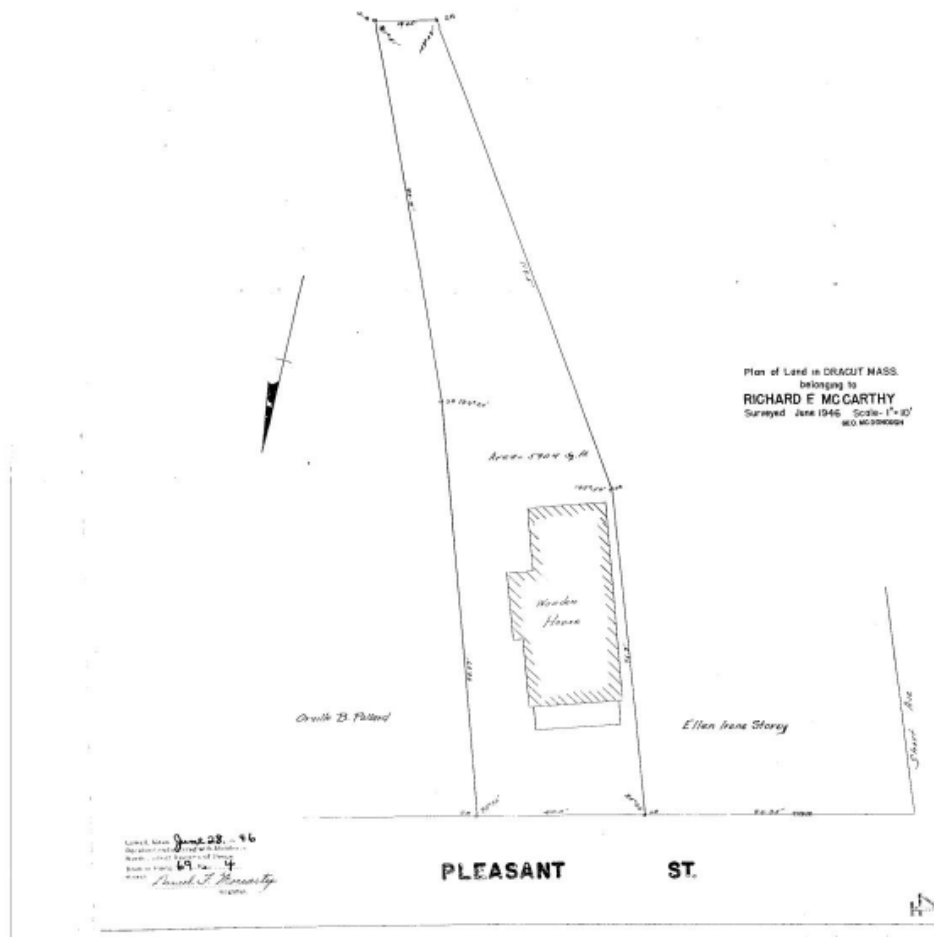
167 Pleasant Street 1946 (MCRD, Plans, 69/4)
